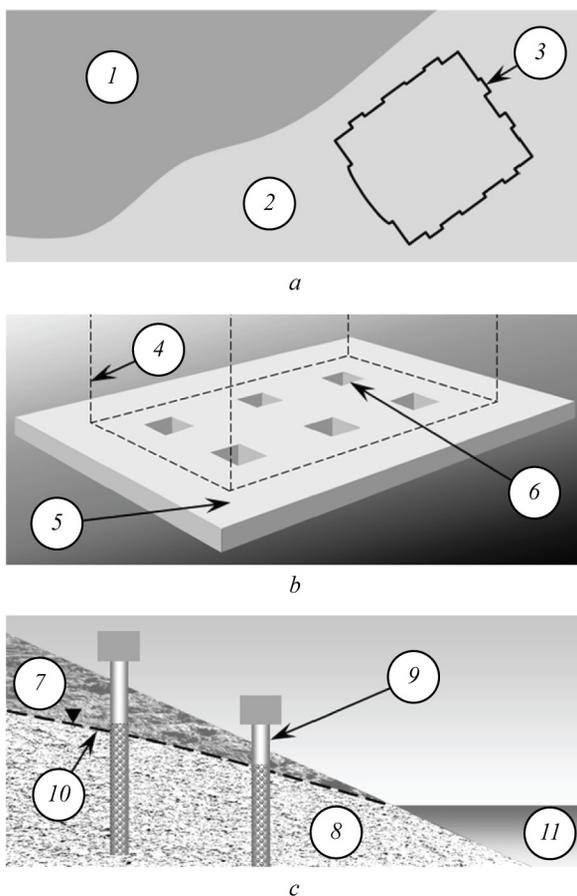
Schemes illustrating the principles of passive anti-suffusion measures: *a* — planning (on the example of optimal building location); *b* — constructional (on the example of monolithic reinforced concrete foundation); *c* — controlling (on the example of groundwater regime observation); 1 — site dangerous from the point of view of the possibility of suffusion development; 2 — site safe from the point of view of the possibility of suffusion development; 3 — building contour in plan; 4 — building contour in perspective; 5 — cantilever outlets; 6 — through hole intended for operational filling of the collapse sink; 7 — suffusion-resistant and (or) suffusion-unstable rocks; 8 — suffusion-unstable rocks; 9 — observation well with necessary equipment; 10 — groundwater level; 11 — water body
